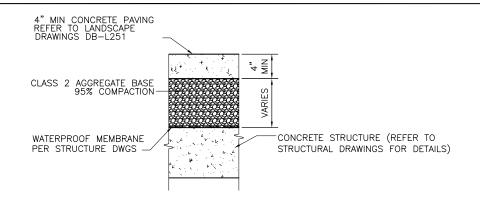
DETAIL- VEHICULAR PCC PAVING (ON-STRUCTURE)
